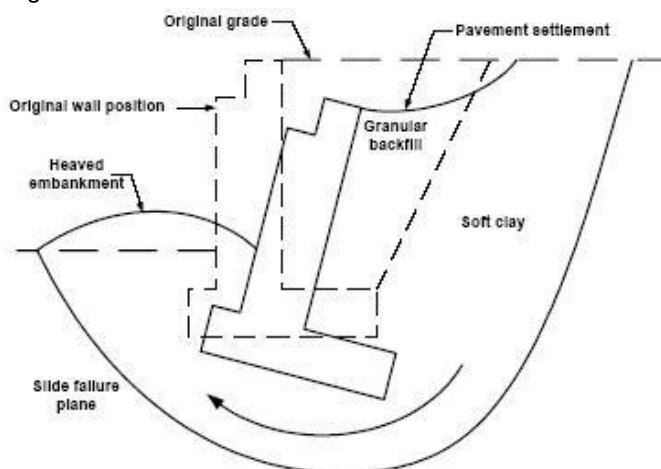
Lateral Movement and Settlement of an Abutment due to Slope Failure
